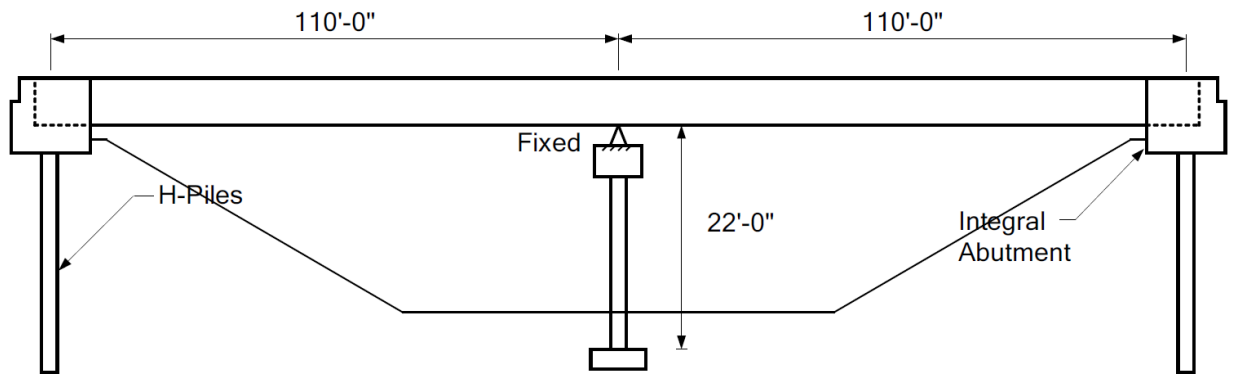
Elevation View of Example Bridge (FHWA 2015, 2-4)
